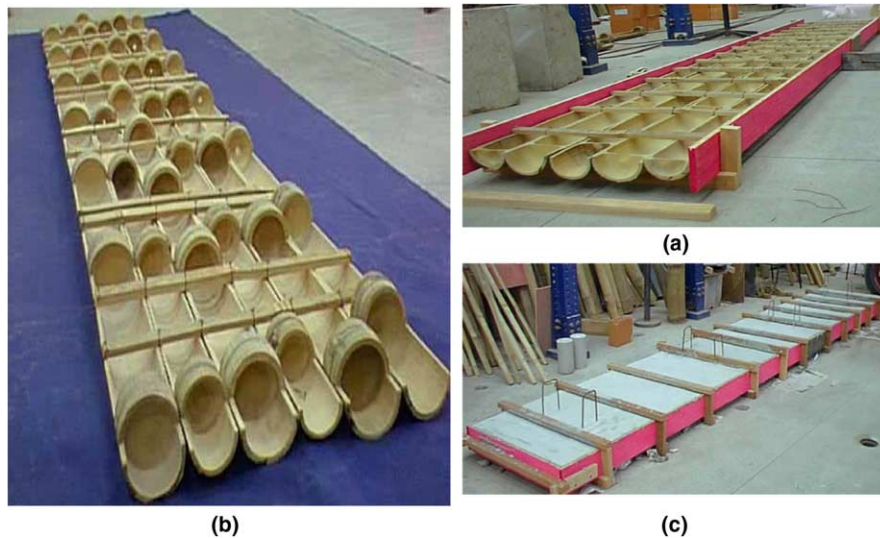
Concrete slabs reinforced with bamboo permanent shutter forms. (a) Half bamboo diaphragm as connector. (b) Second type of connector. (c) Slab before testing.
